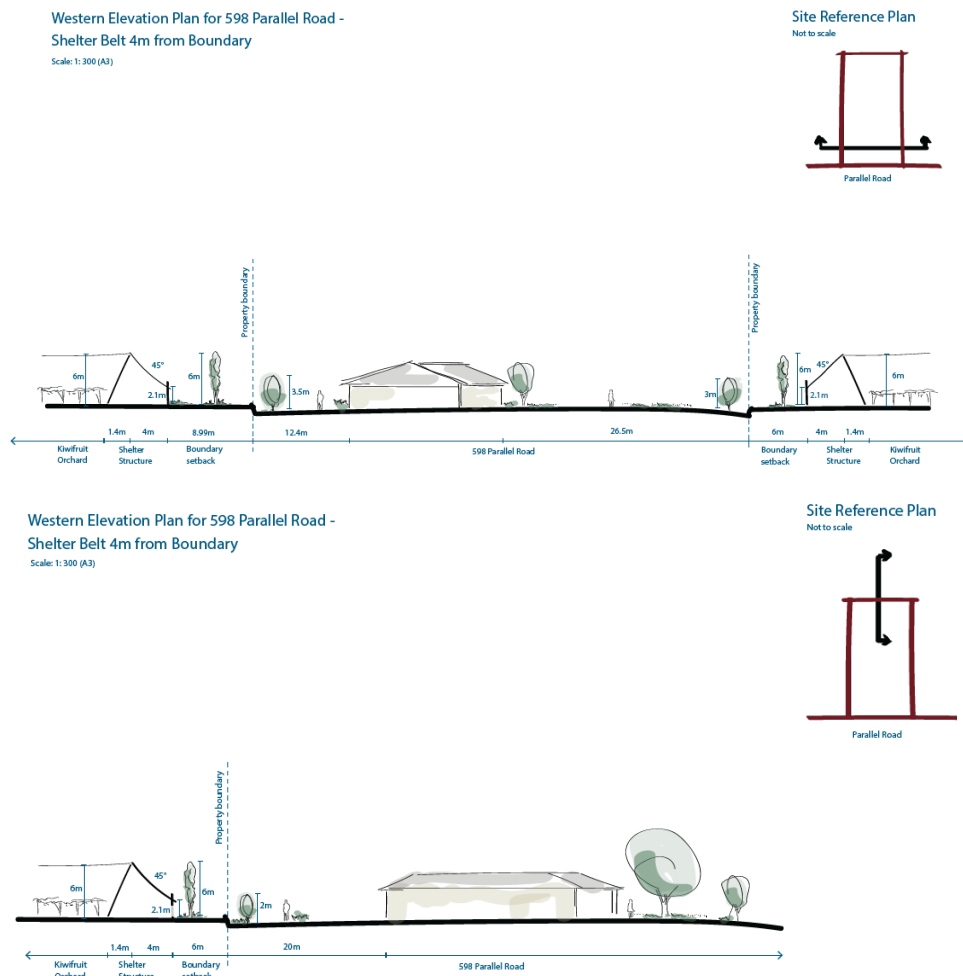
South and west elevations of the proposed artificial shelters and the shelterbelts.
